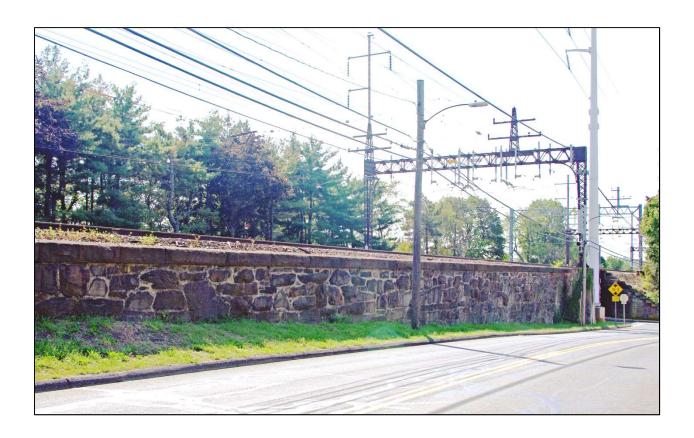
Fort Point Street Railroad Bridge (1941), south elevation, camera facing north.
